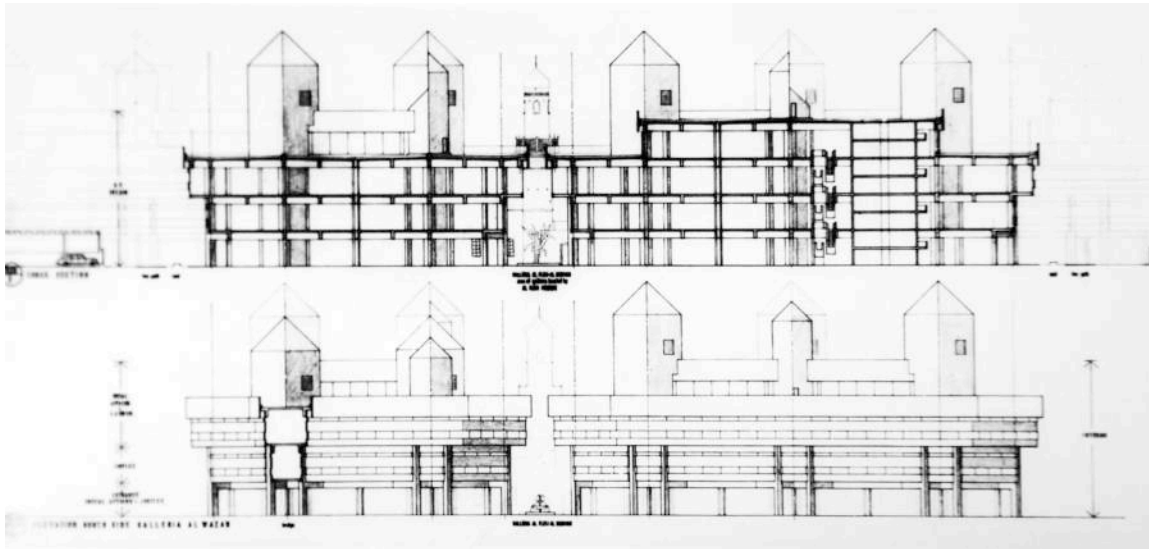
A&P.S.: Elevation and a section of the demonstration building
